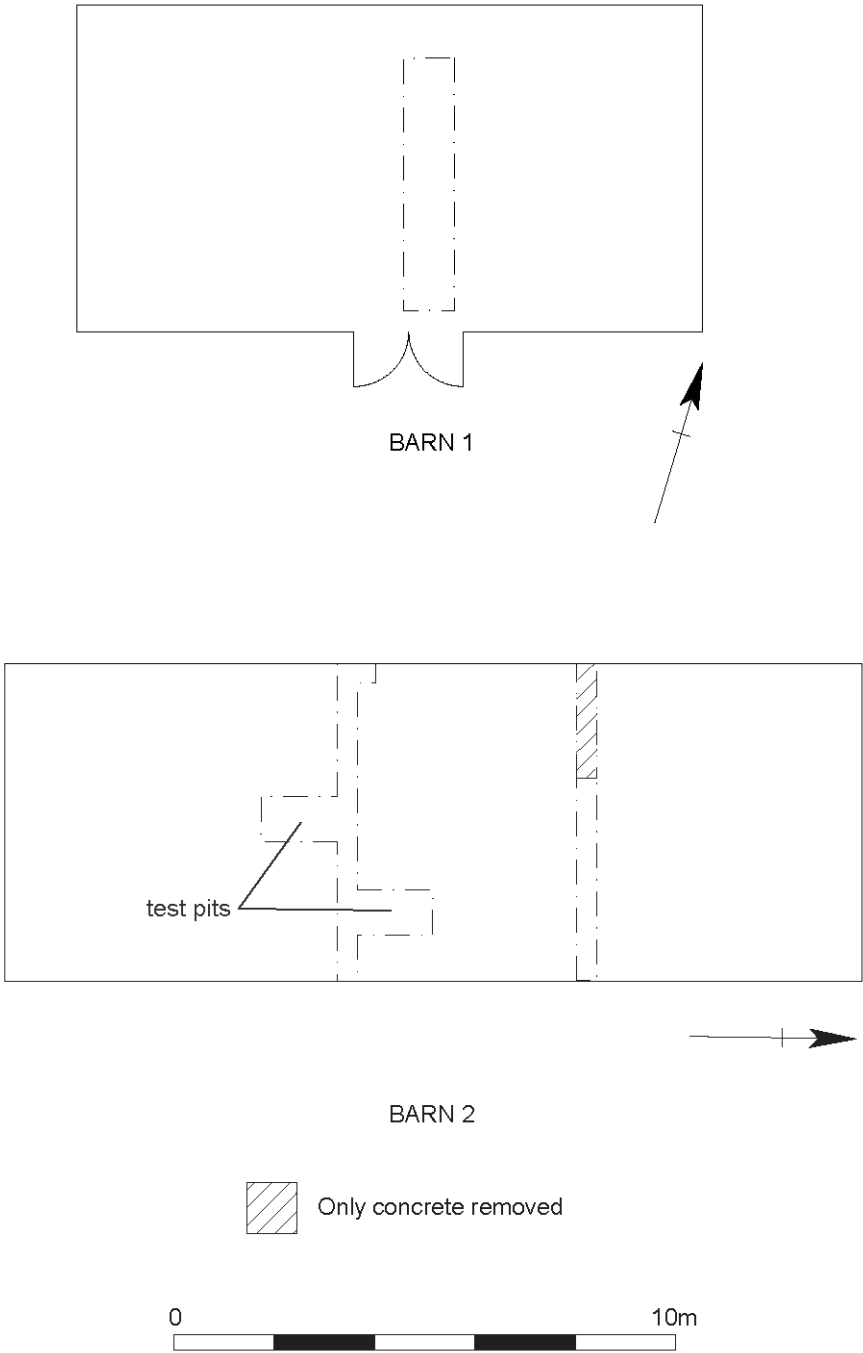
Location of trial trenches and test pits in Barns 1 & 2 (*scale as shown*)
